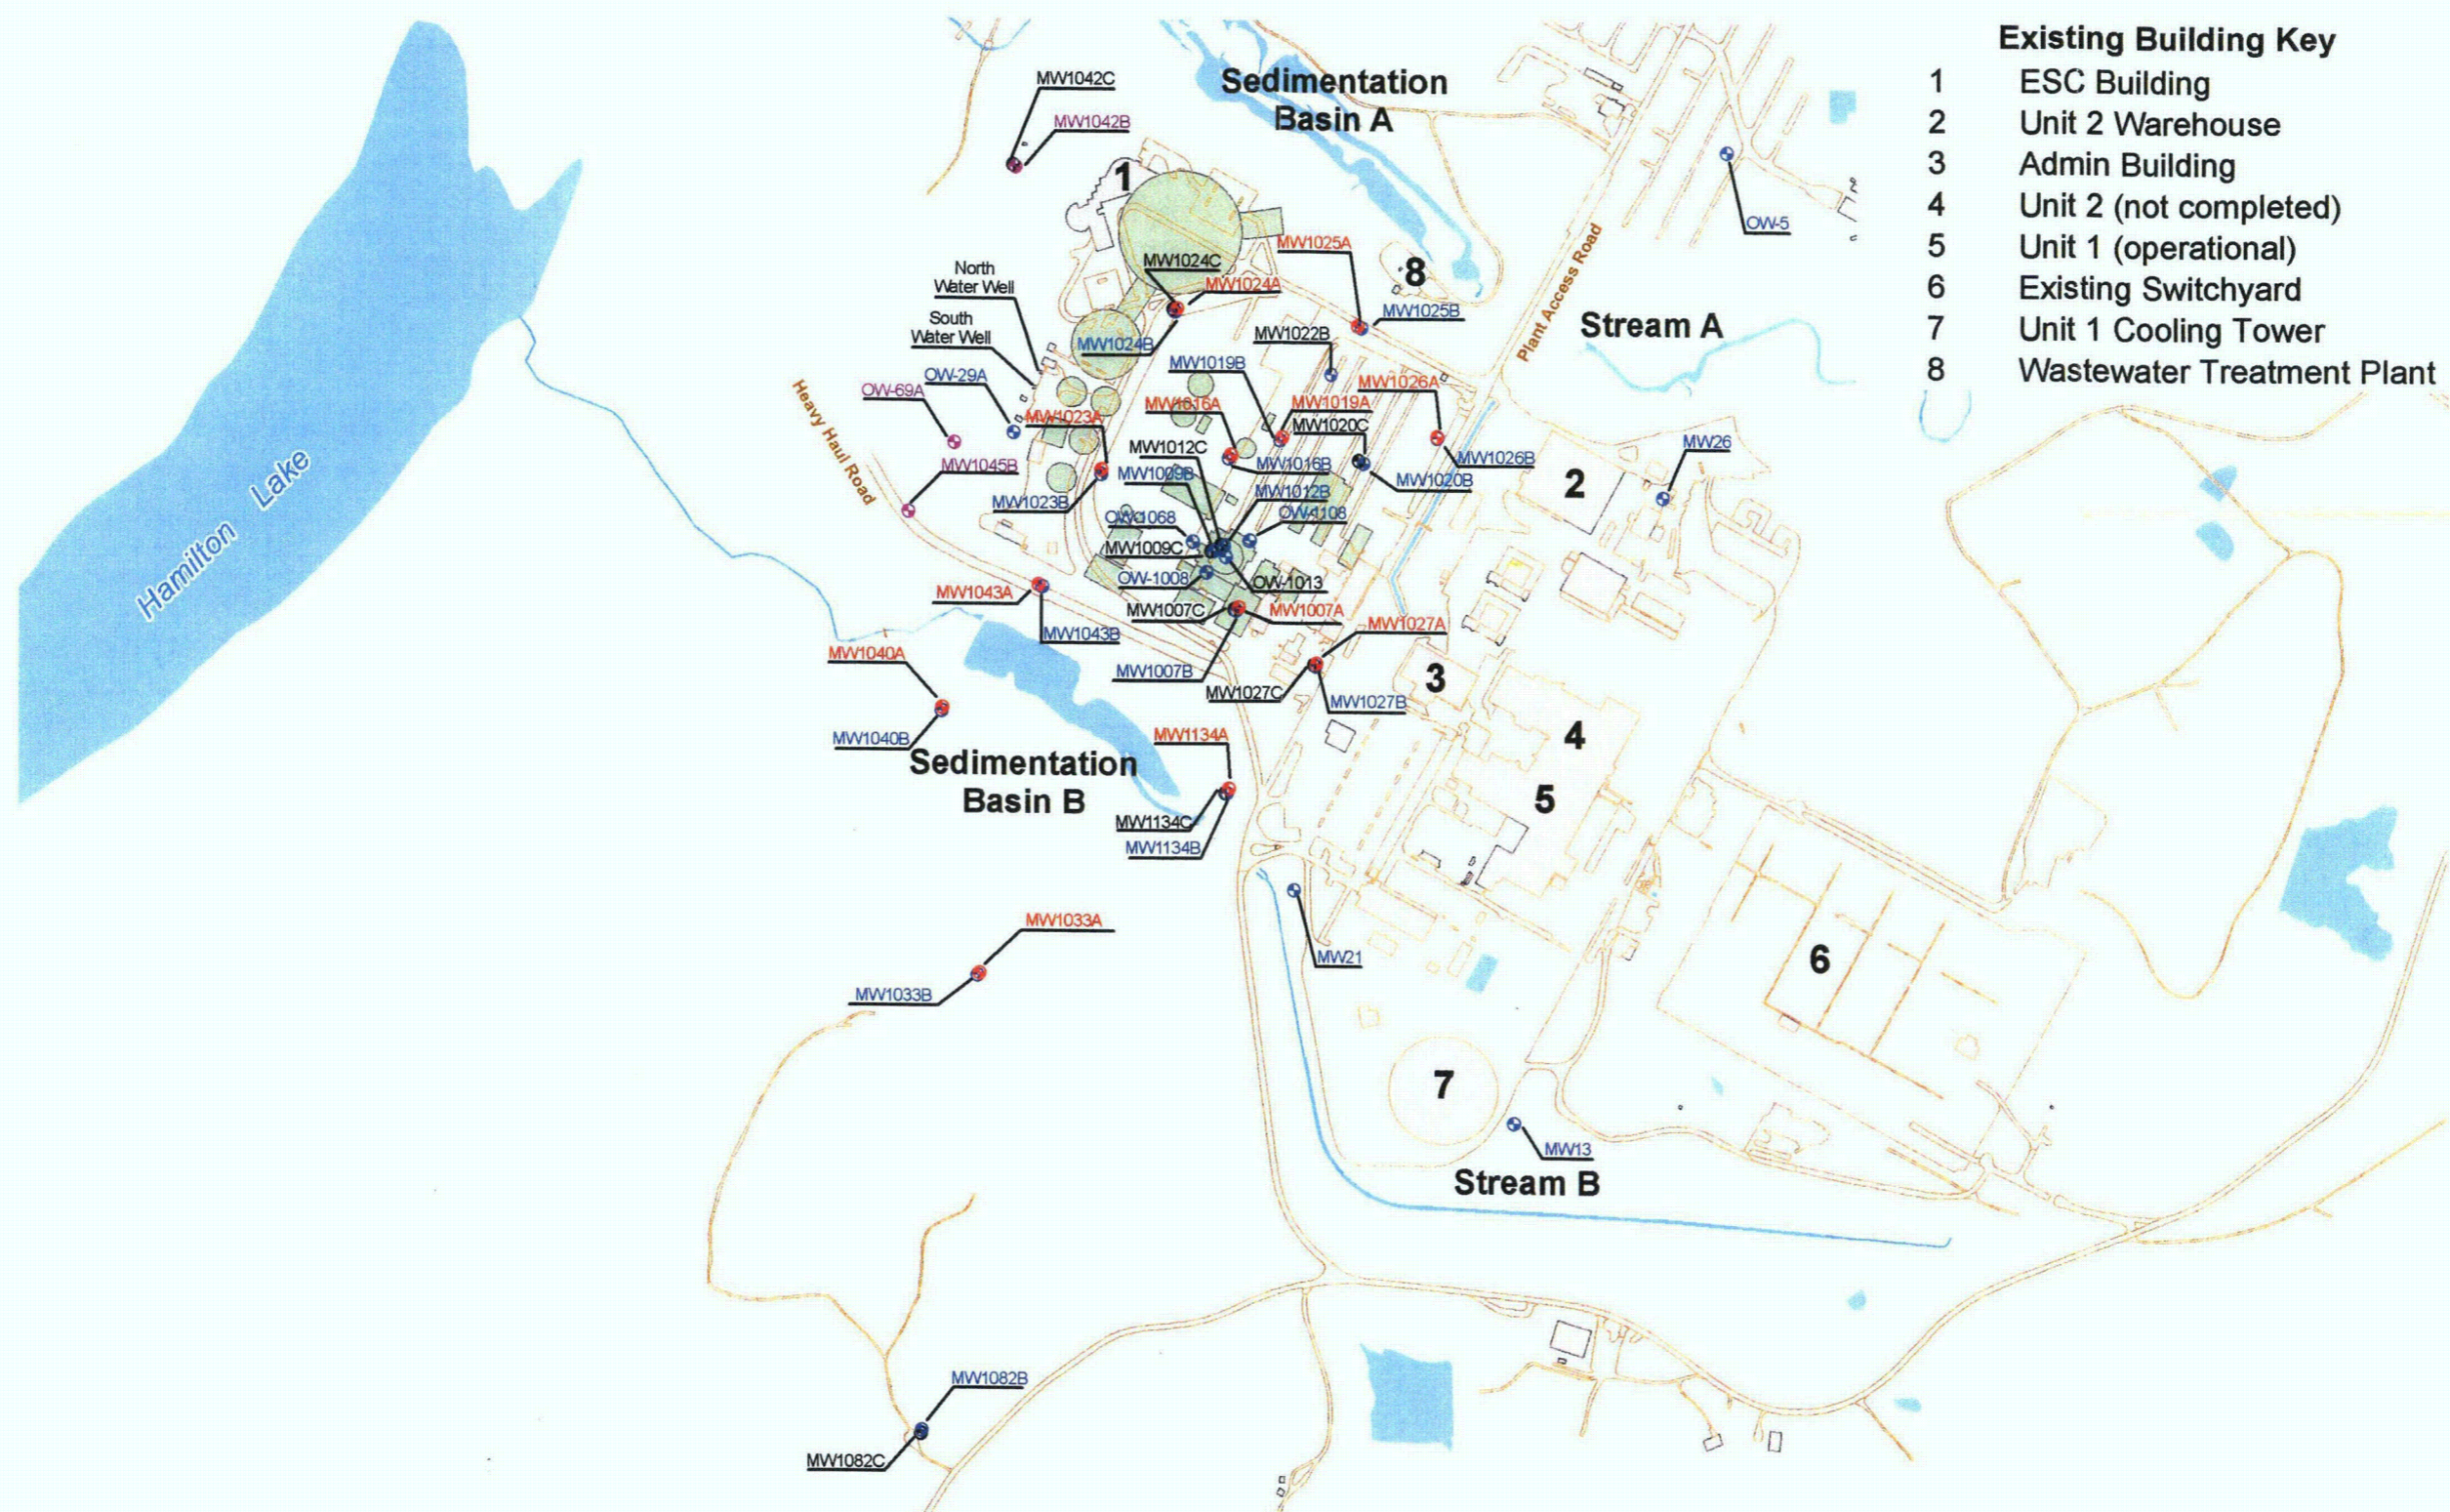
SITE PLAN-EXISTING AND NEW MAJOR STRUCTURES
